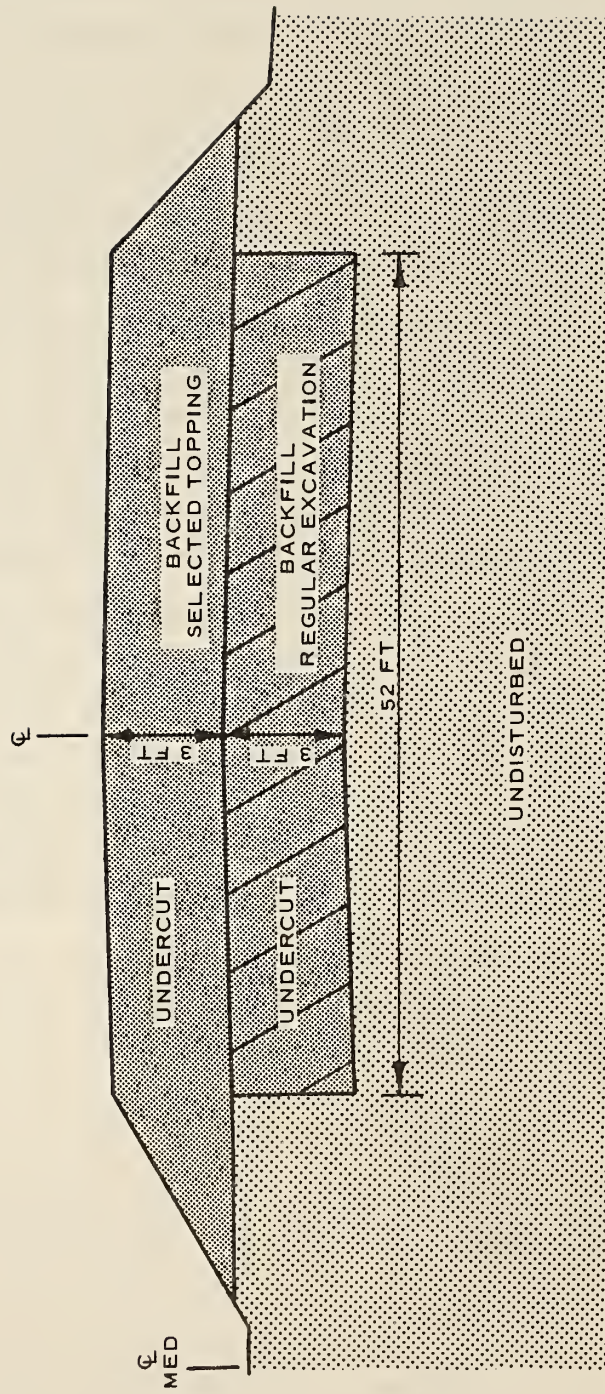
Typical example of subexcavation and replacement for an interstate highway
